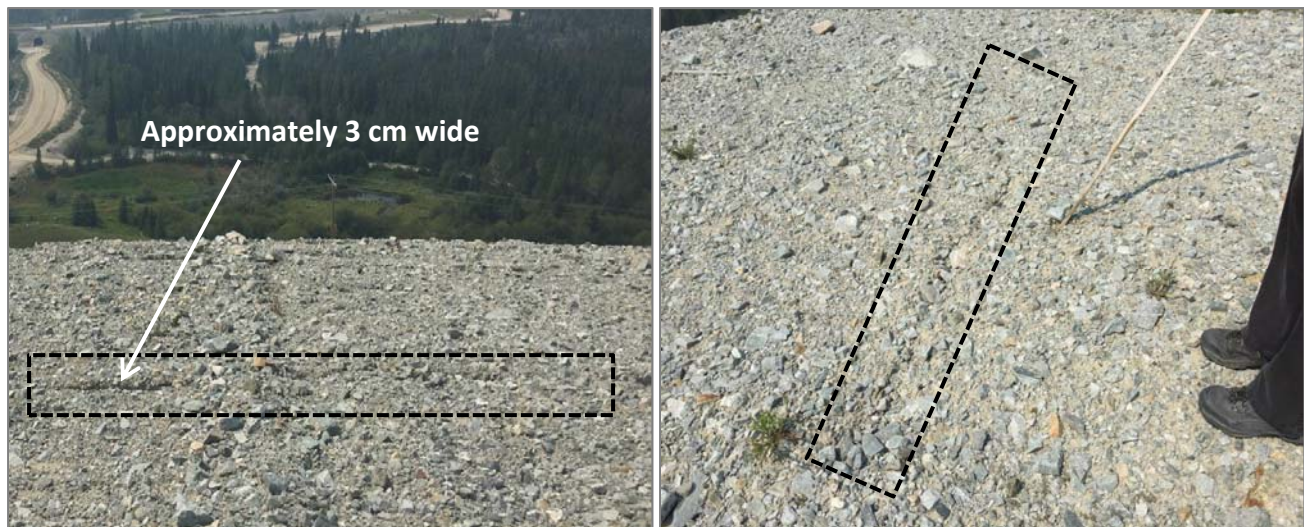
Downstream slope of Dam No. 1, looking west from R3 Seepage Pond. (BTH-2018-05)
